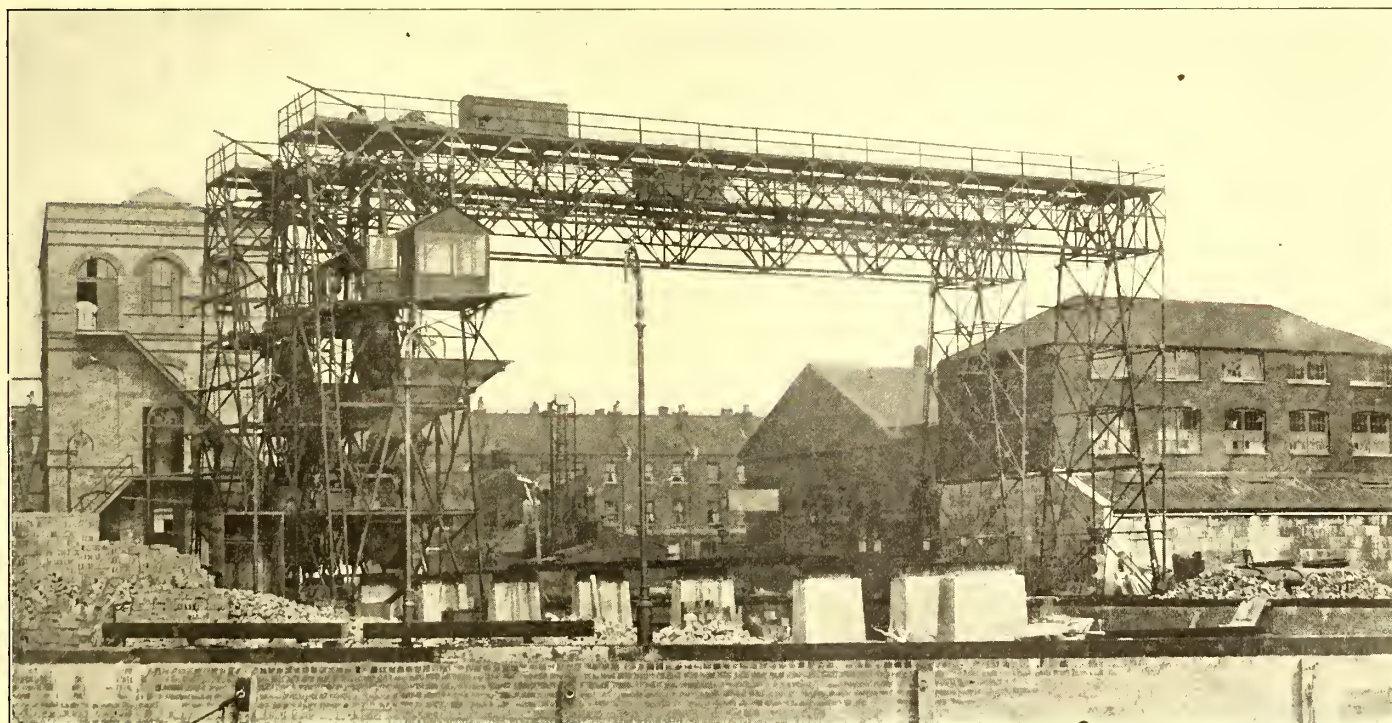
OIL COOLING HOUSE, BARGE UNLOADERS AND CHELSEA CREEK RETAINING WALL AT CHELSEA CREEK GENERATING STATION, EAST END
